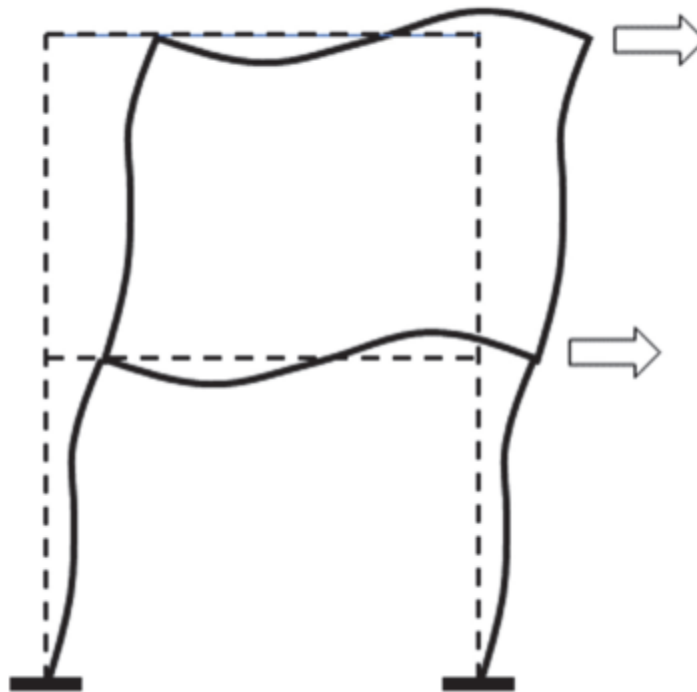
Typical deformed shape of moment-resisting frame responding to lateral forces.
